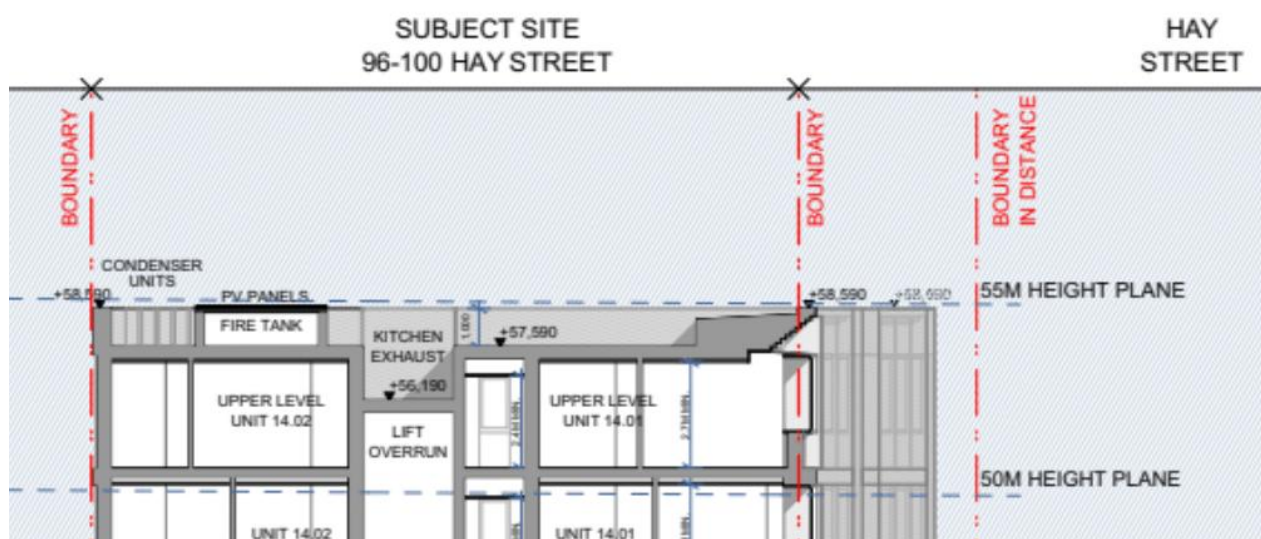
Section Extract – Proposed Varied Areas Above 50m Height Plane (Source: Candalepas Associates)
